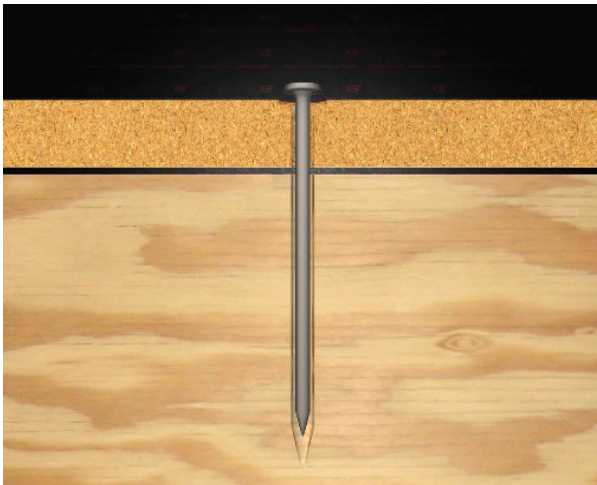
When first installed, moist sub-floors swell and push the nail up, then fail to tighten around the loosened nail when HVAC systems are turned on at move-in, causing sub-floor squeaks.
